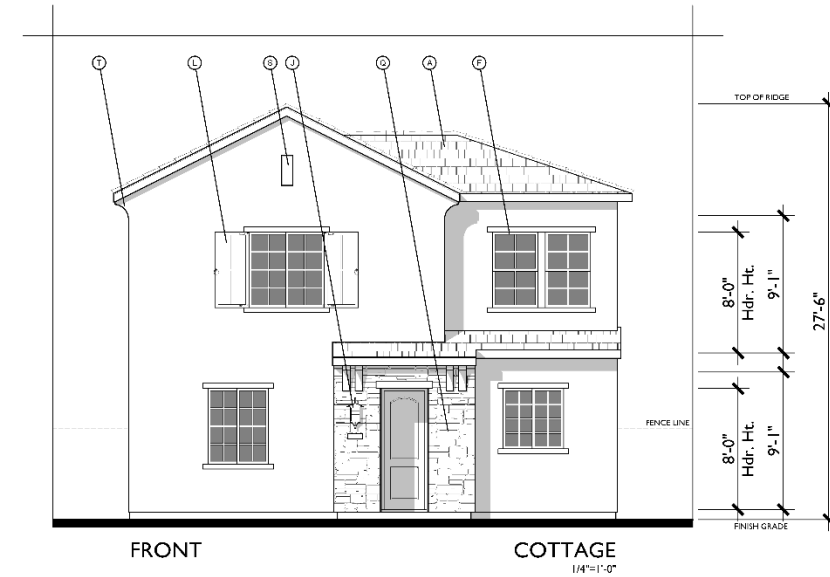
Cottage Elevation - Cluster Plan 1
